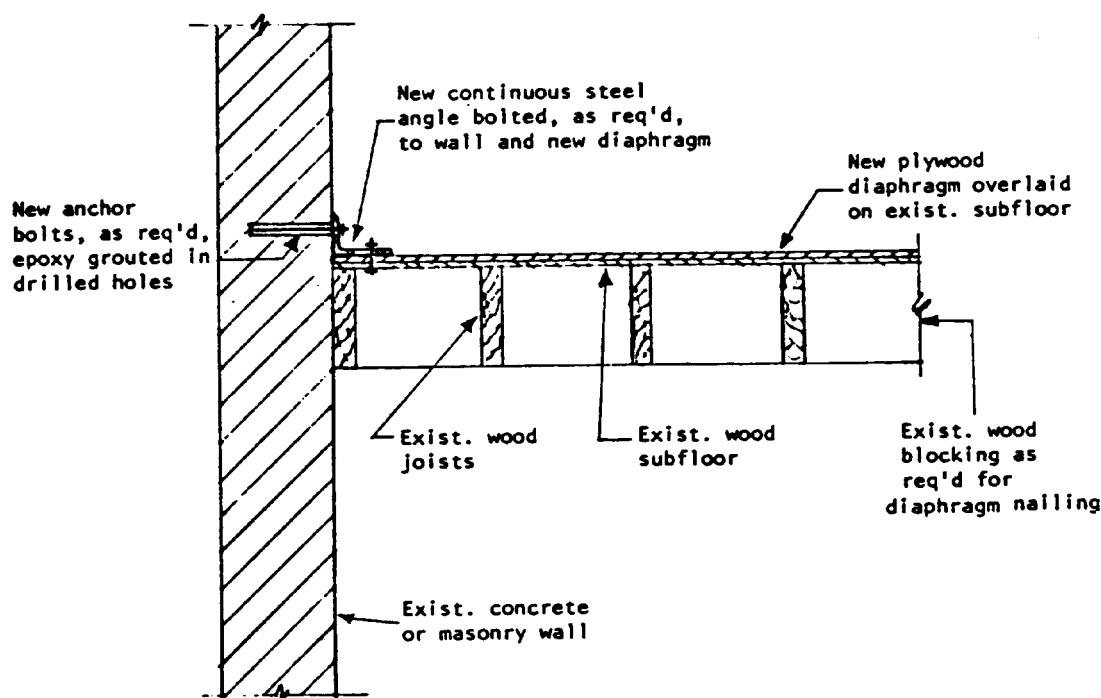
Strengthening of existing wood diaphragms in reinforced masonry buildings
